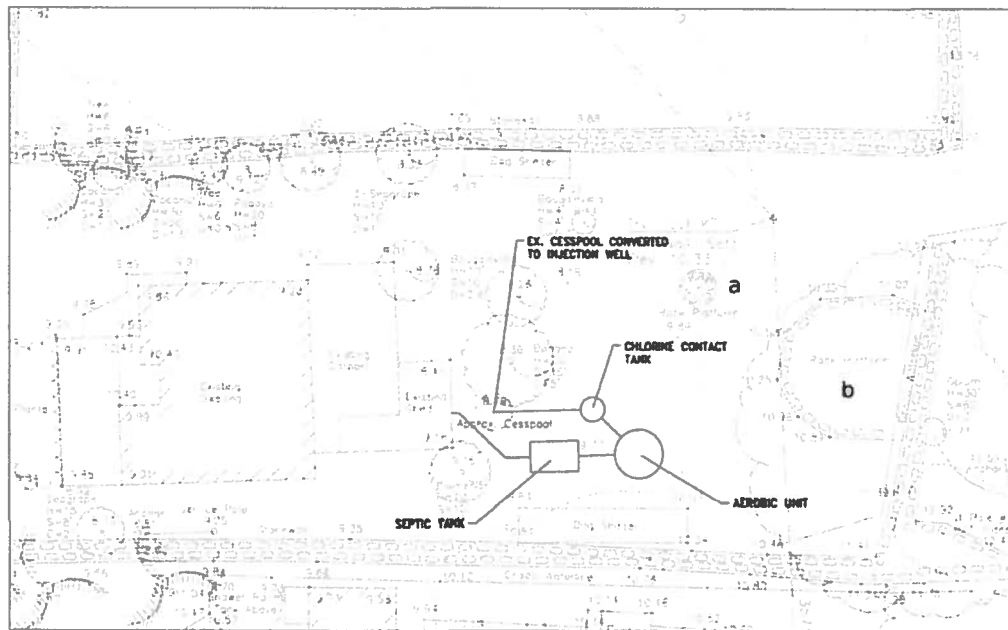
Engineering map showing the location of proposed wastewater facilities on parcel 19 and rock platforms: *a*, small platform; *b*, large platform.
